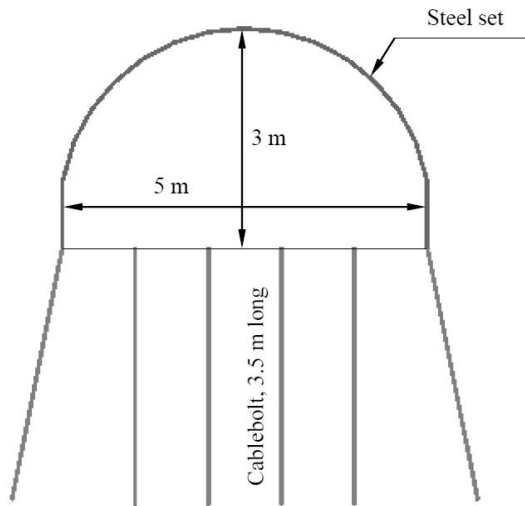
Pattern of support systems for roadway at 200 m overburden depth.
